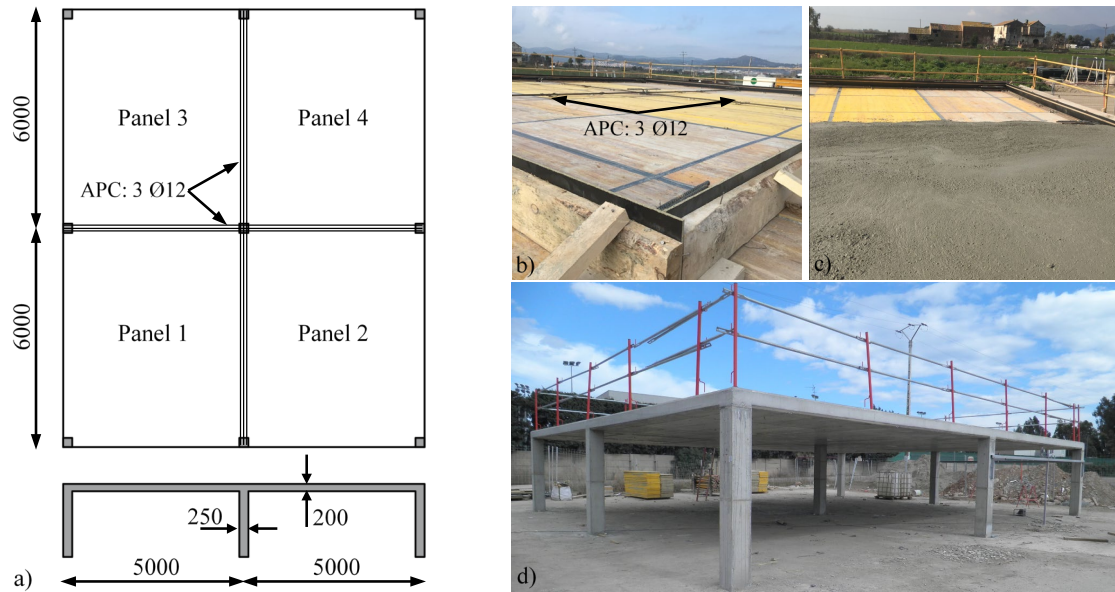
a) Geometry of SFRC flat slab; b) Installed formwork; c) SFRC pumping; d) SFRC flat slab after formwork striking
